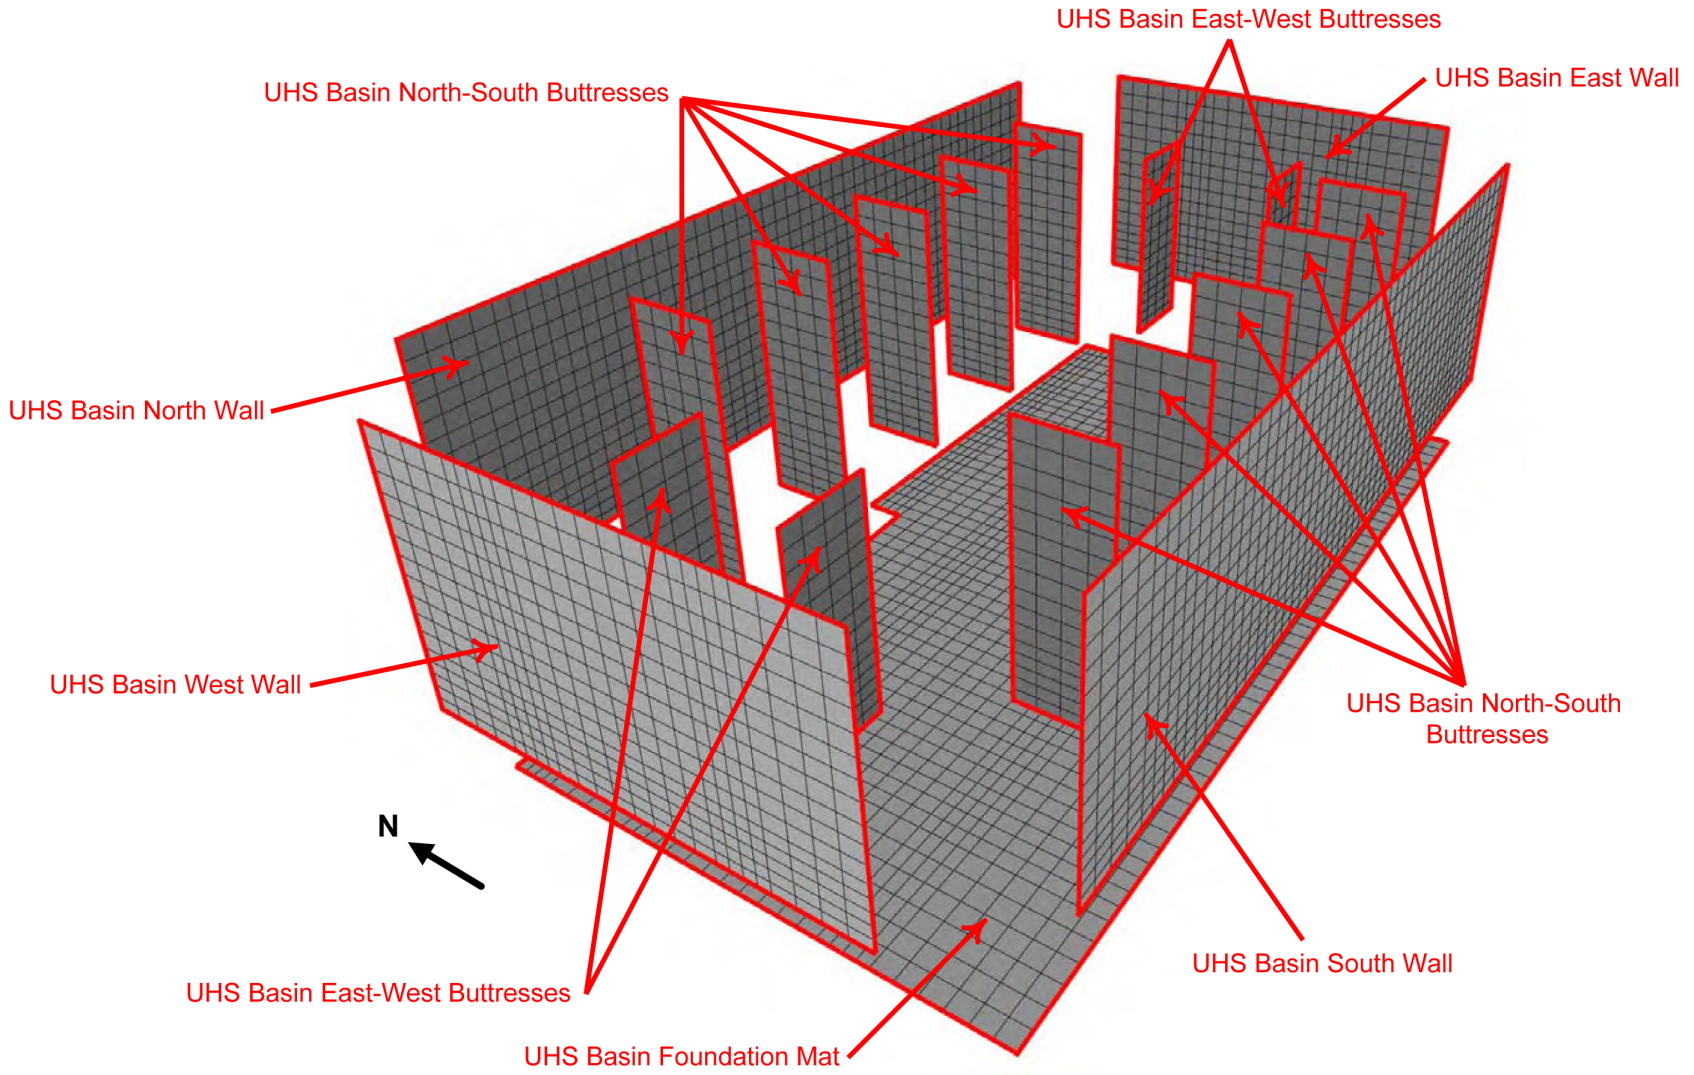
H.6-40B UHS Basin Wall and Slab Labeling Convention
